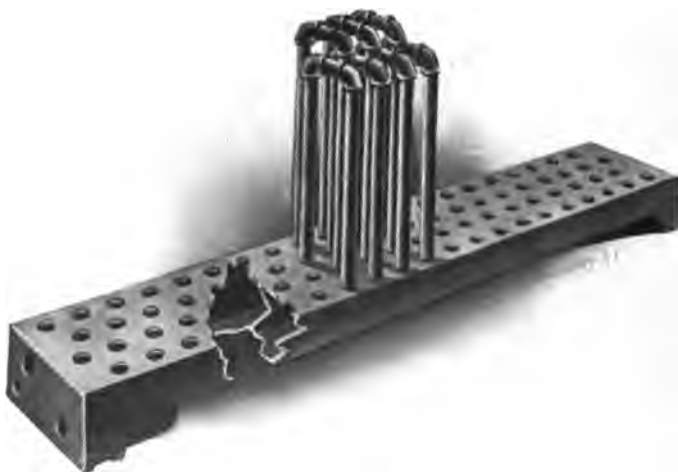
American Blower Co.'s Hot Blast Heater, Four-pipe Section
